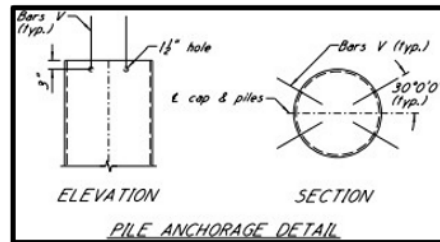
below depicts the details of the connection between the steel pipe piles and the concrete bent cap of the bridge over Cassidy Bayou. Figure 2-19 also illustrates the most commonly used details for the concrete plug.
